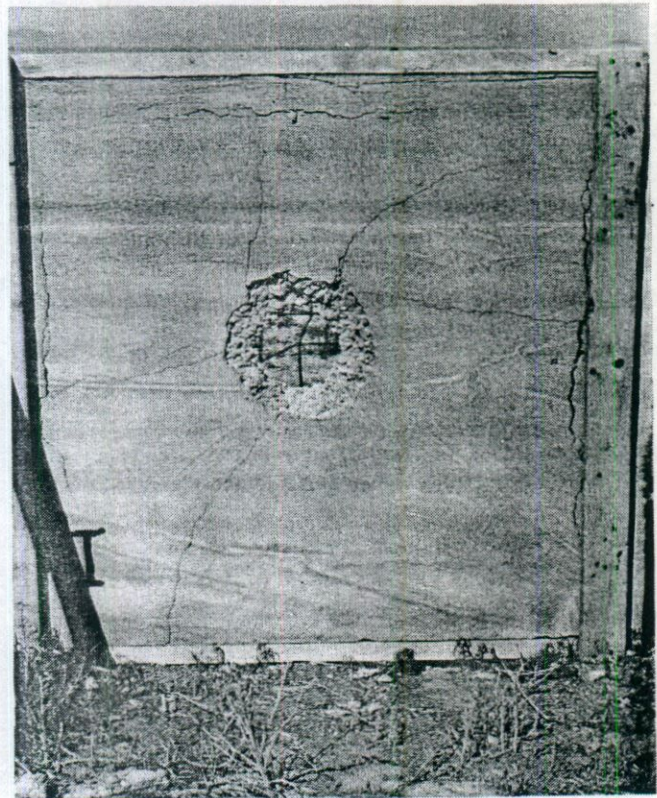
Penetration of 4-Inch-Thick Concrete Slab without Plates
